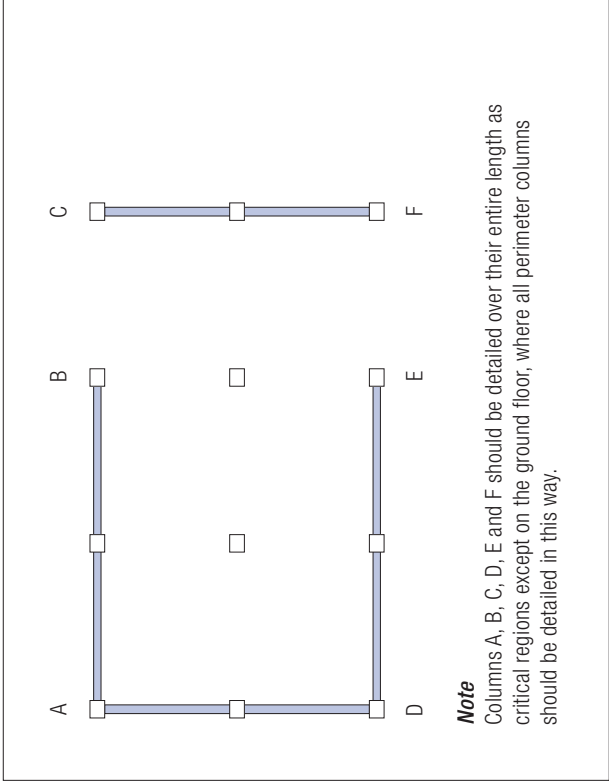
Illustration of columns interacting with masonry requiring special detailing
